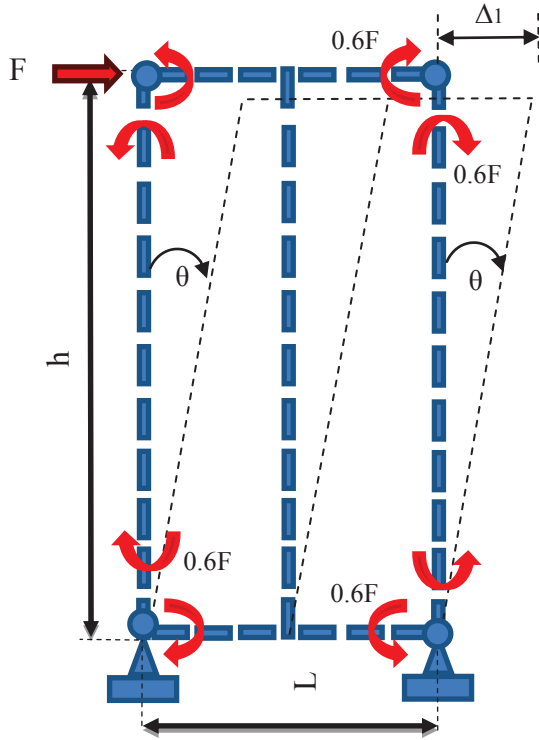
Loaded and unloaded state of vertical stud wall unit.
